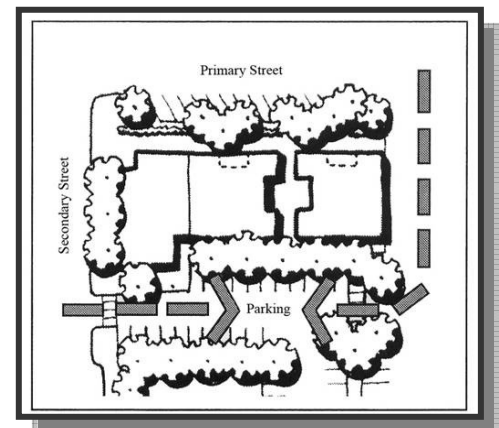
Use of fences and landscaping to fill gaps that may occur between structures, thus maintaining street façade continuity.
